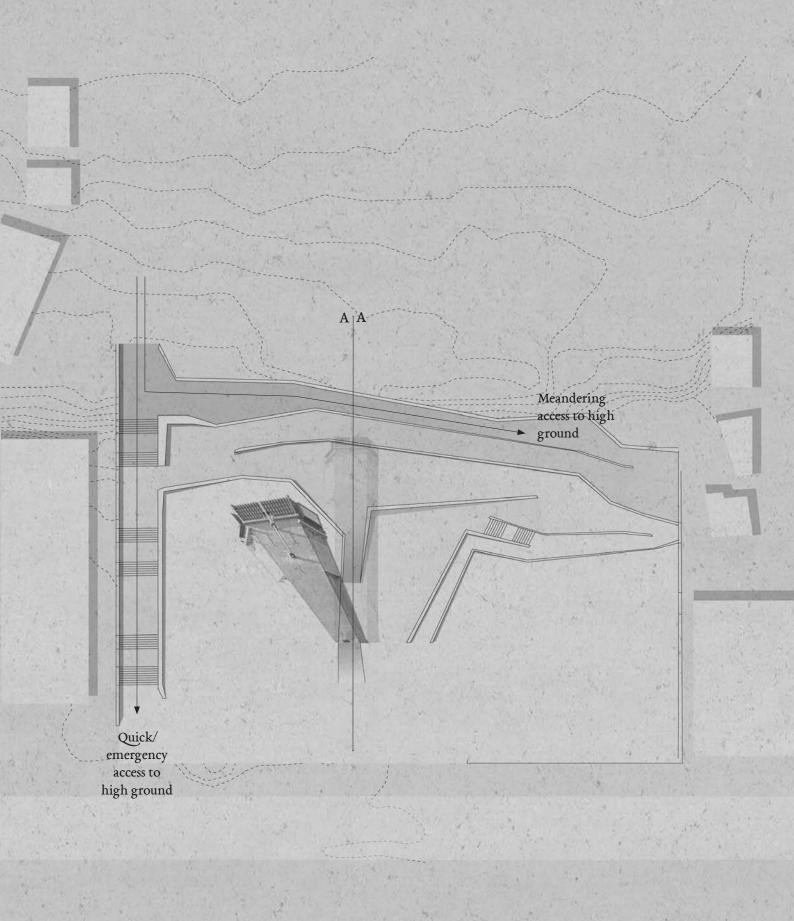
Water tower 2 and Dunetop Park 1-500 Plan
